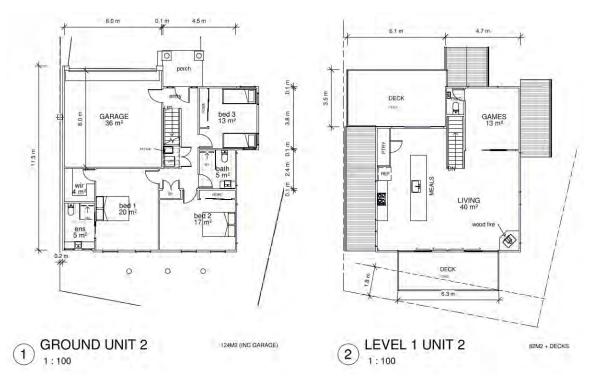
Shows the dwelling 2 (unit 2) floor plans.
